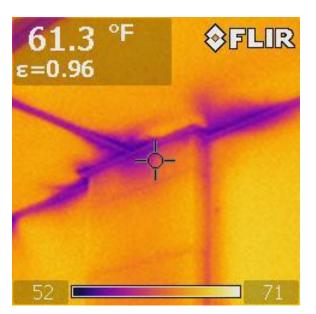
Infiltration Detection—Wall and Ceiling Seams
